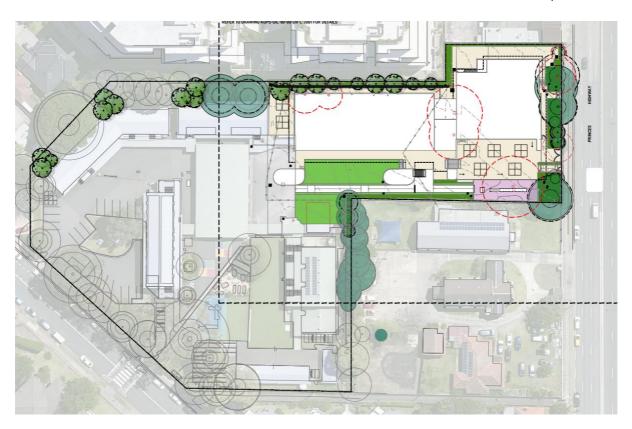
Schematic Landscape Plan (Ground Ink, 2025)
